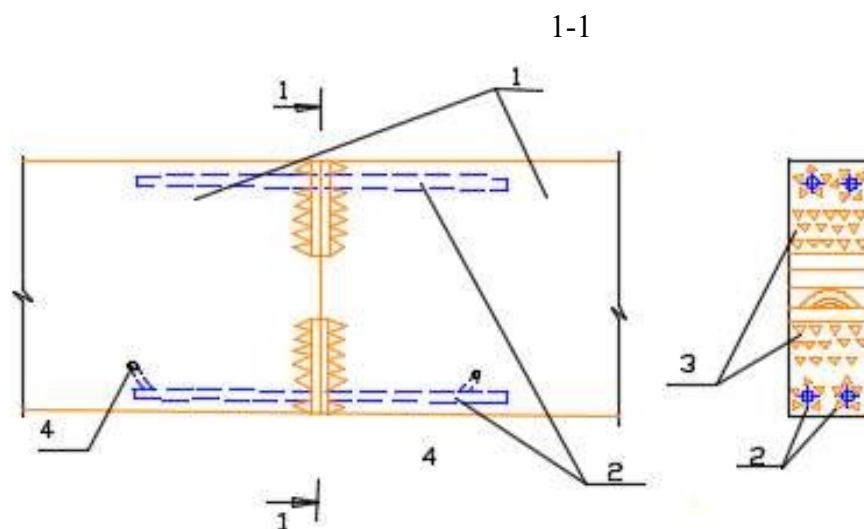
Node of connection of elements of wooden structures (Khabarovsk PI): 1 - joined wooden elements; 2 - reinforcing bars; 3 - toothed metal plates; 4 - through holes for air outlet
